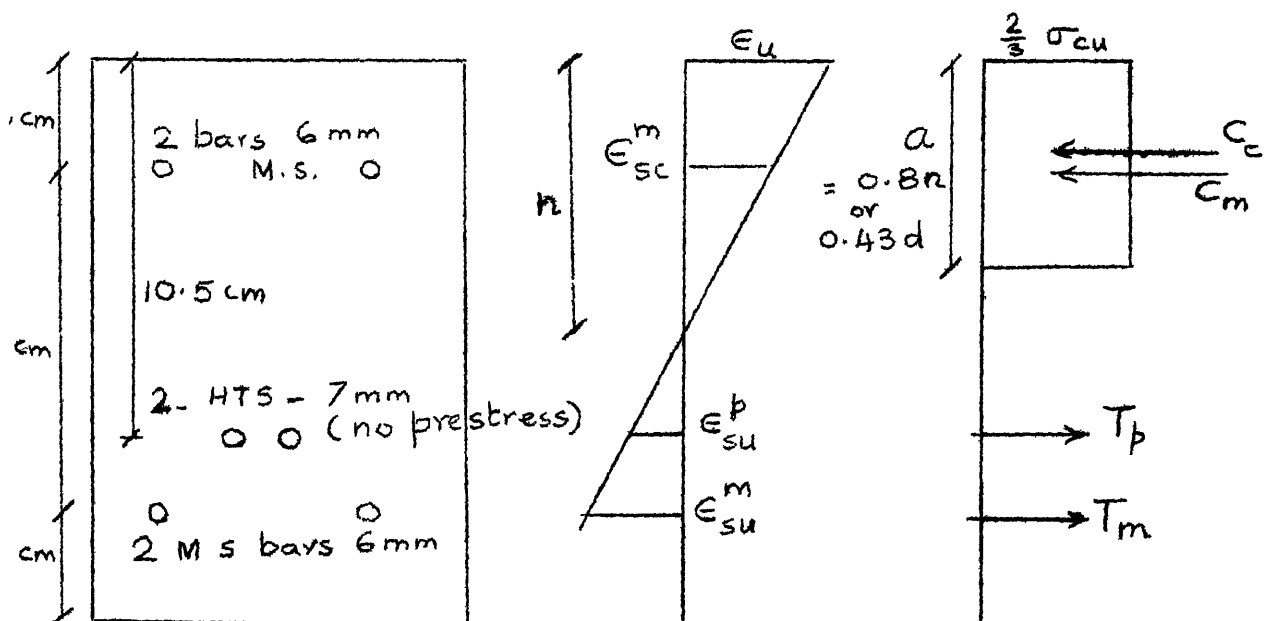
DETAILS OF SECTION OF BEAM-2
